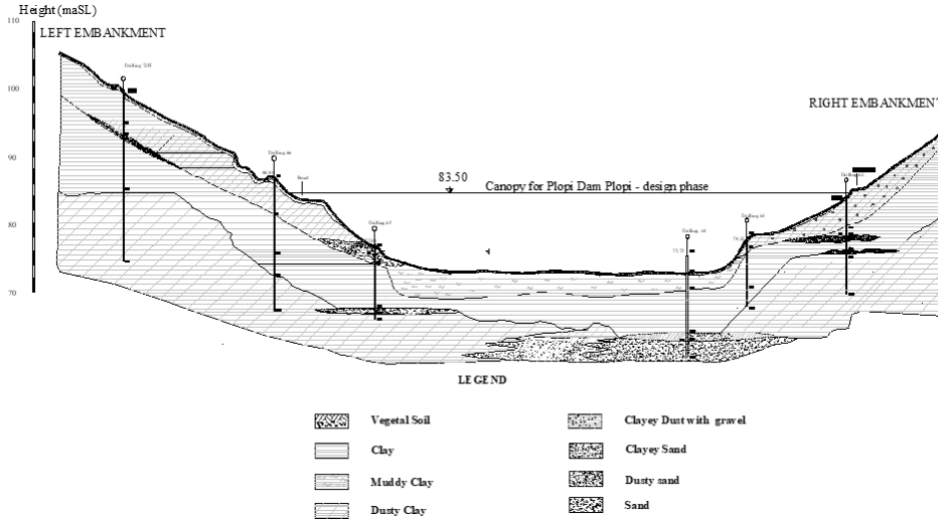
Longitudinal section through The Plopi Dam foundation ground
